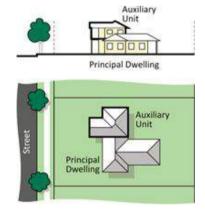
Layout of an Auxiliary Unit located above the Principal Dwelling
